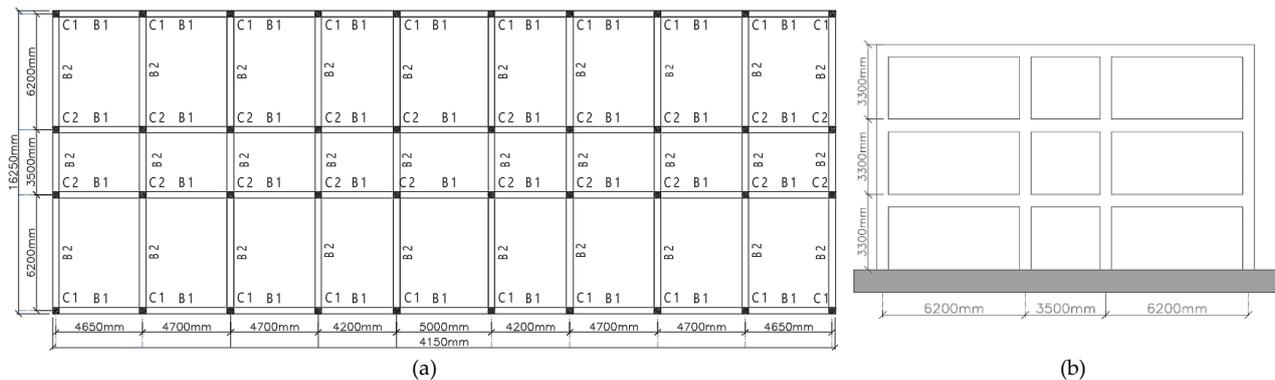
From Sharafi et al. [41] A-type three-story Structures (a) first-floor plan, (b) RC frame (transverse direction)
